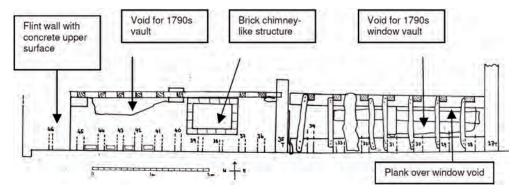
Plan of west end of south wall measured at the wall-plates. David Clark.
